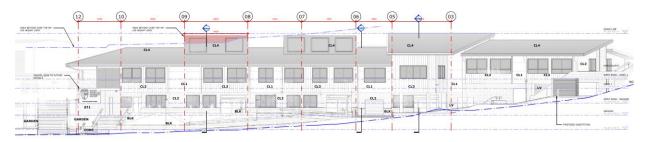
Elevation of the new learning building when viewed from Kosciuszko Road
